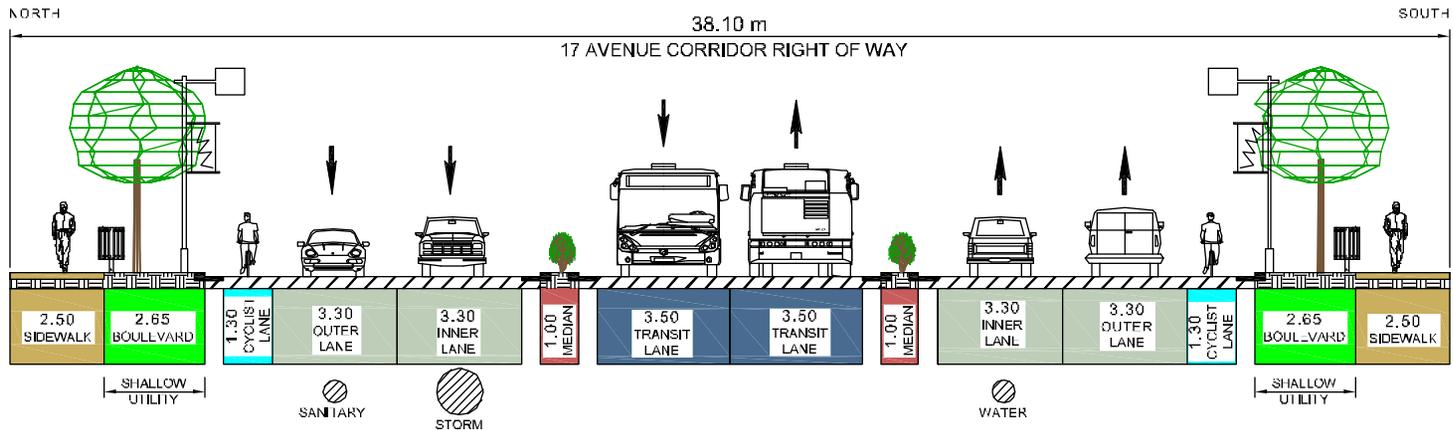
Cross - Section for Reduced Urban Boulevard Segment
